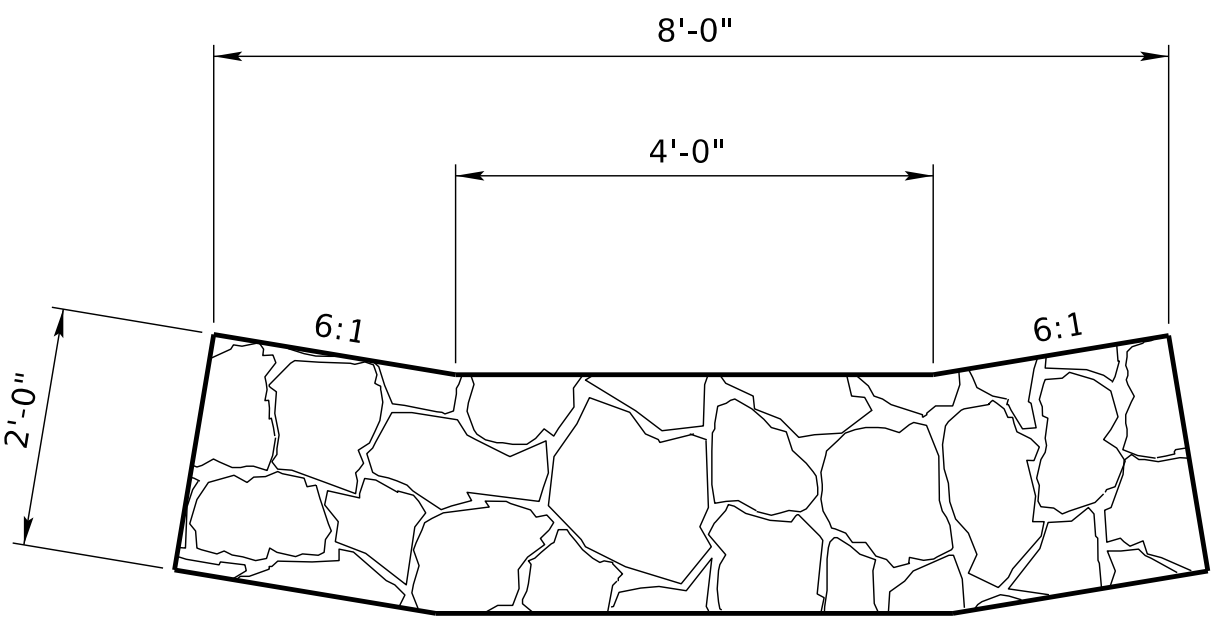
DETAILS OF ROCK RIPRAP SCOUR HOLE
